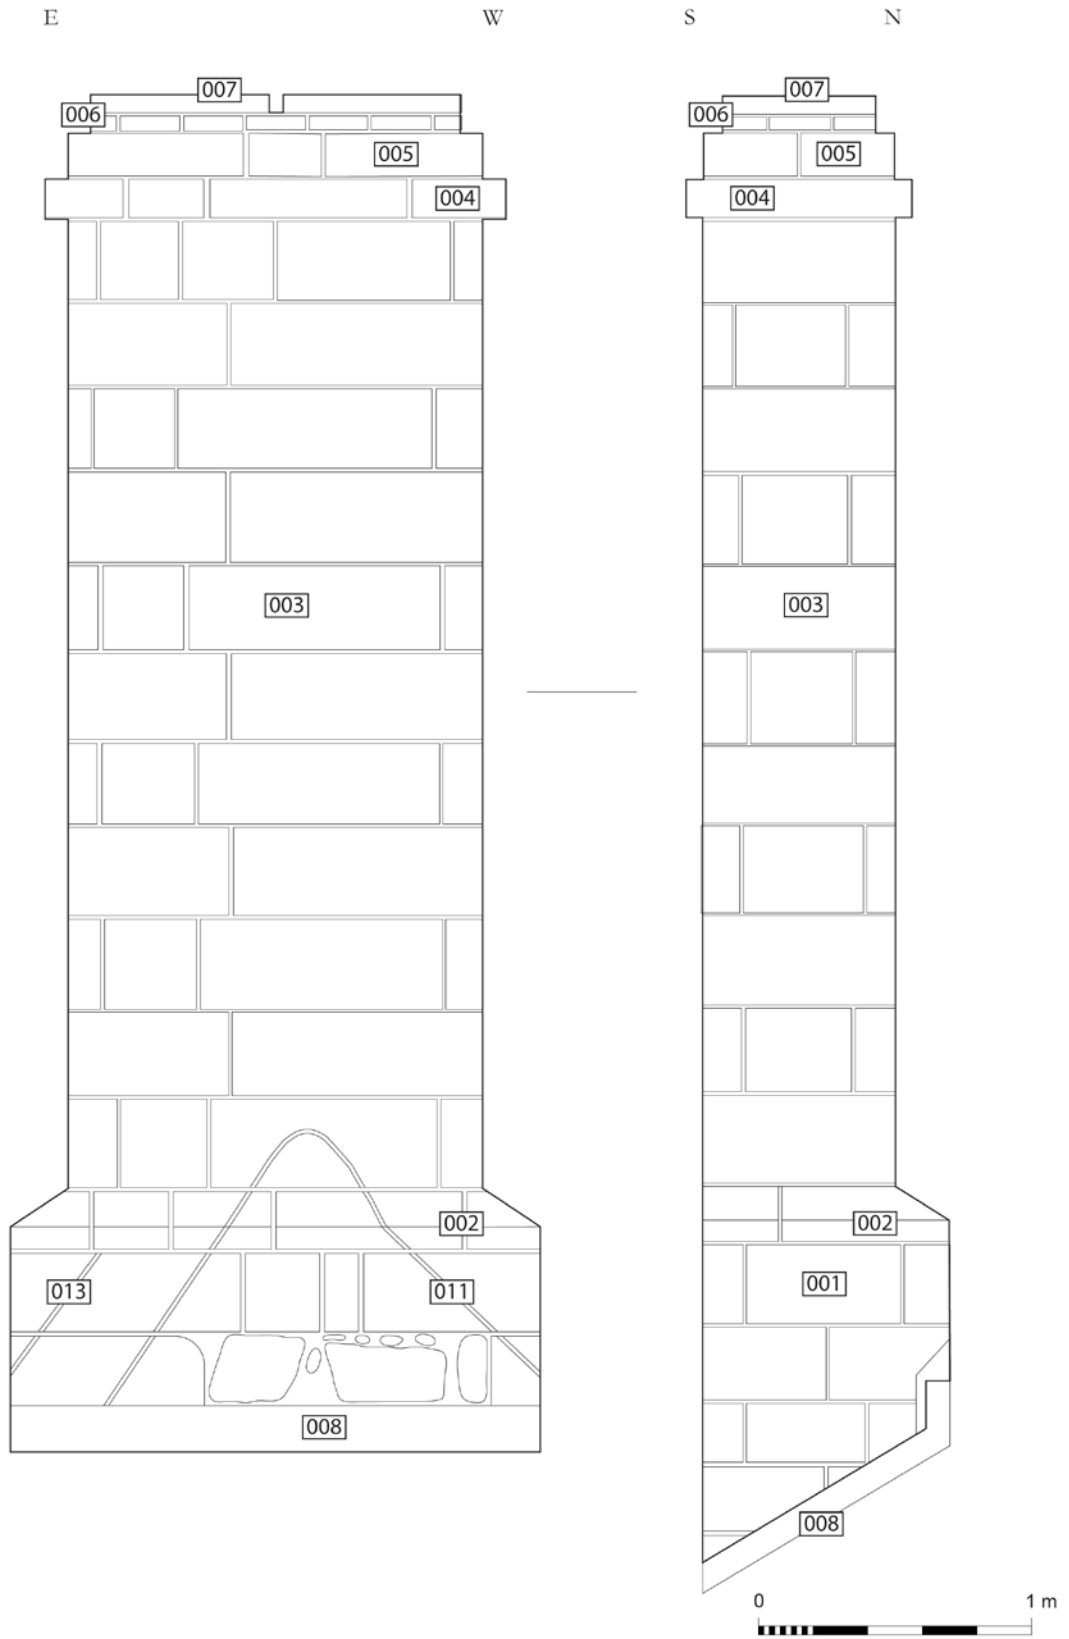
Chimney RC12, northern elevation (left), and eastern elevation.
